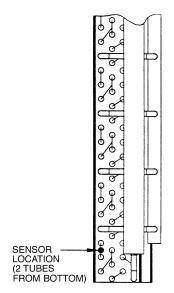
E — Motormaster III Sensor Location (48AJ,AK,AW,AY060 and 48EJ,EK,EW,EY068)
